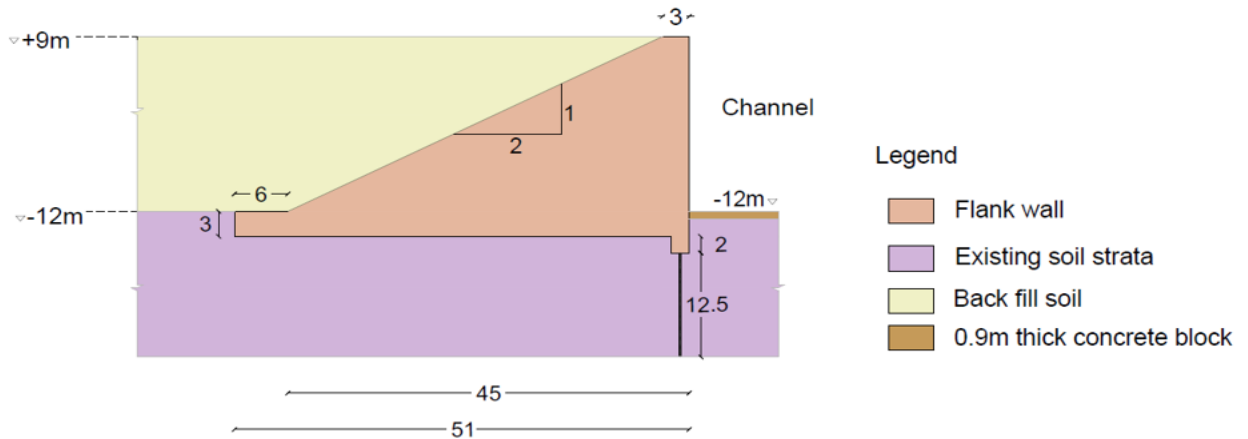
Schematic cross section of Downstream Vertical Flank Wall
